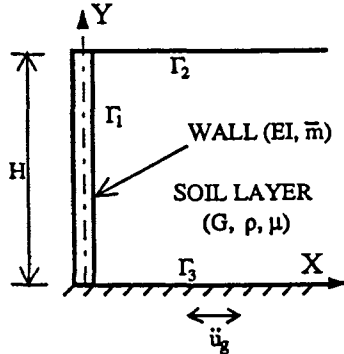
Flexible retaining wall and soil system (Paper 4.17)
